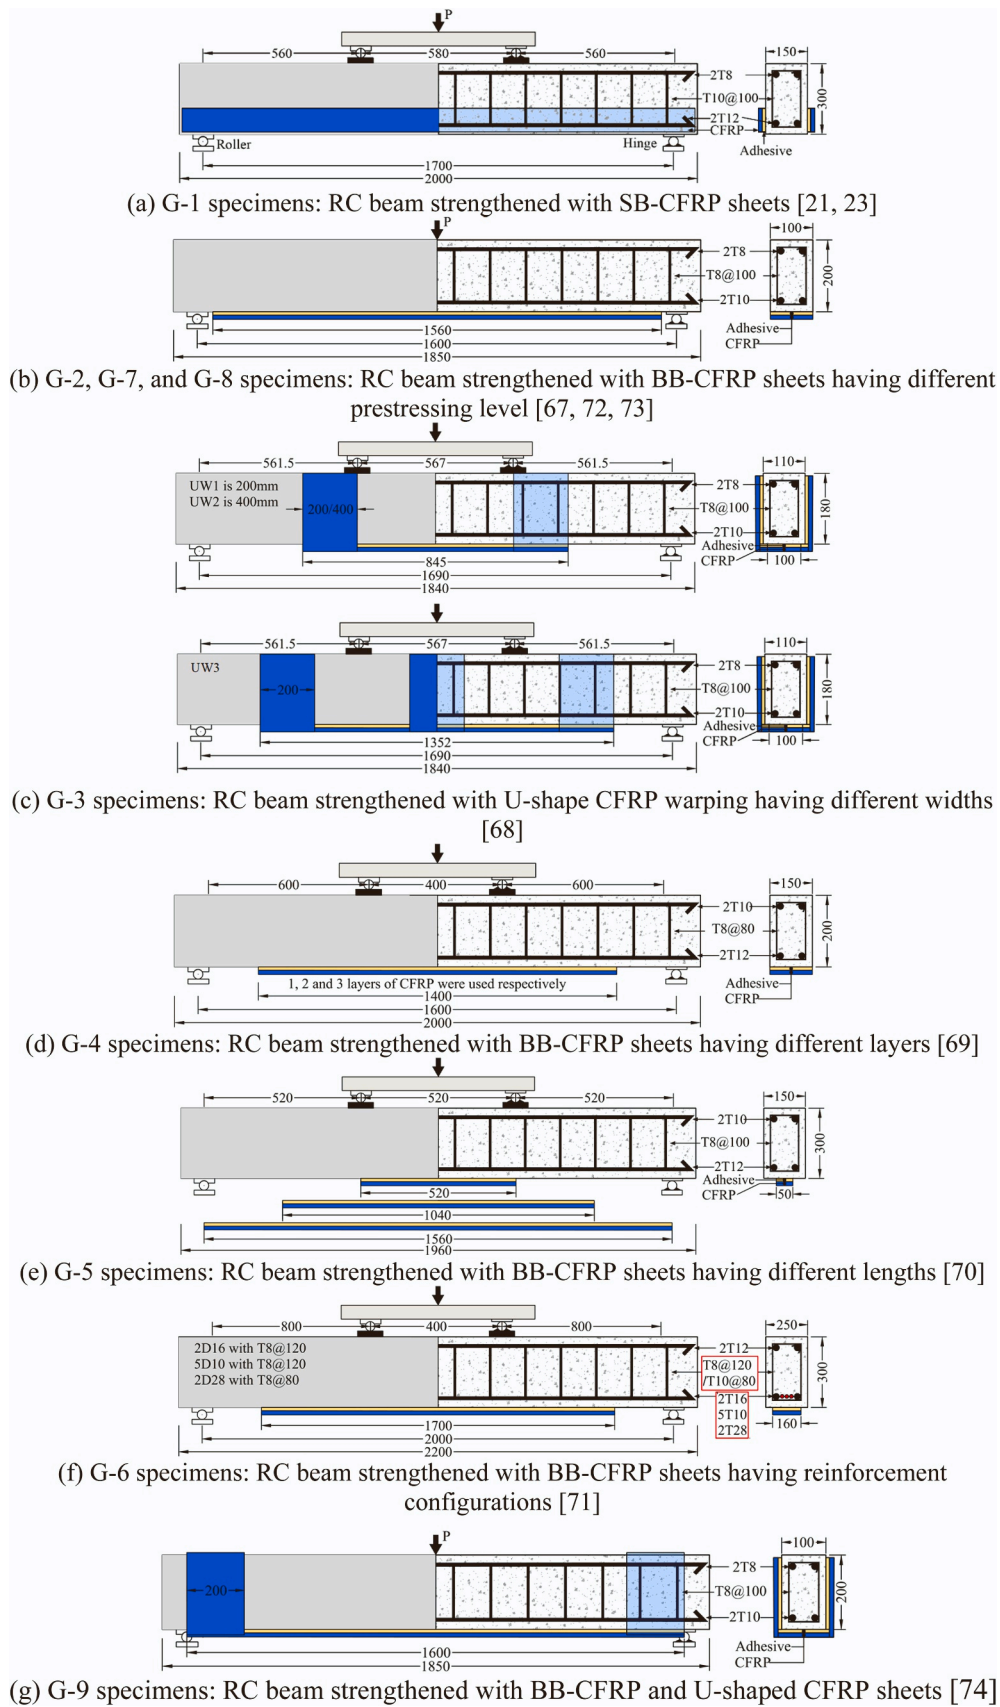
Test setup, reinforcement and CFRF details, and cross-section of the beams.
